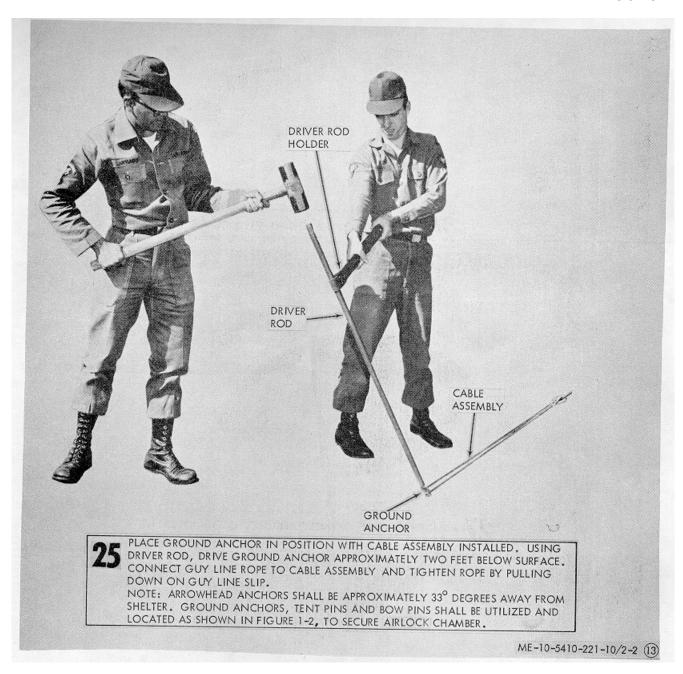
(13). Erection of expandable shelter, (sheet 13 of 18).
